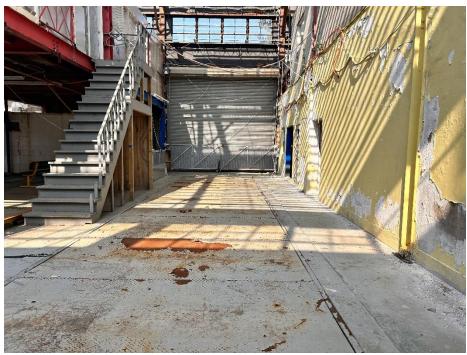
Former truck scale located in the northern part of 725 Clinton Street (facing west).
